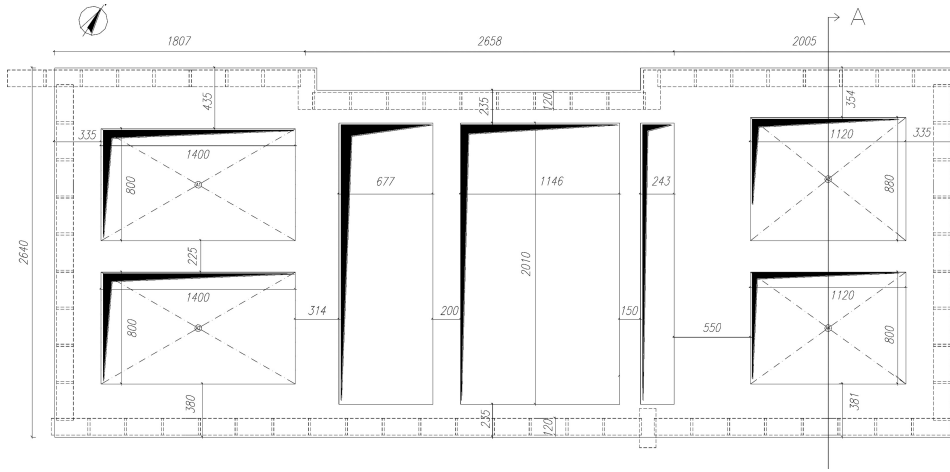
Detailed plan view of the upper slab (dimensions are given in centimetres).
